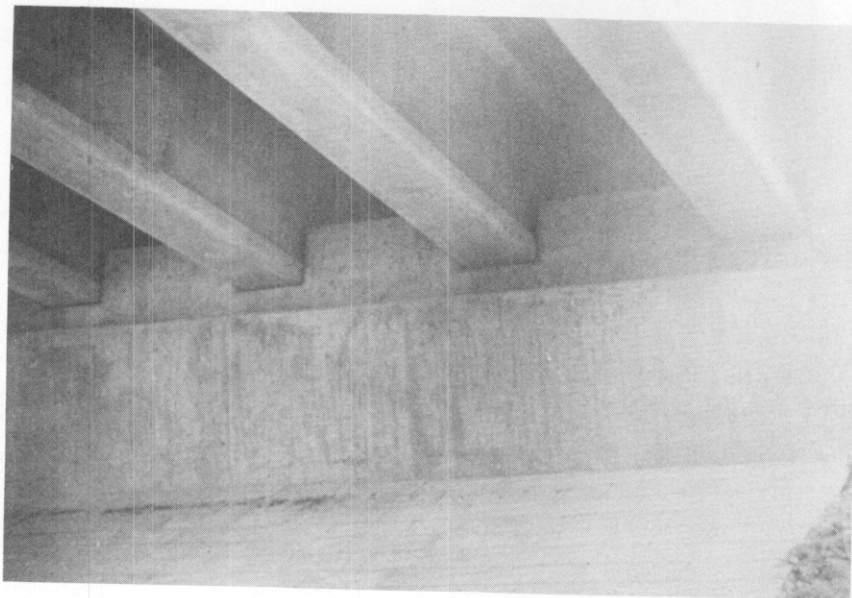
Jacking Shelf for Jackable Abutment on South 277 Street Bridge
